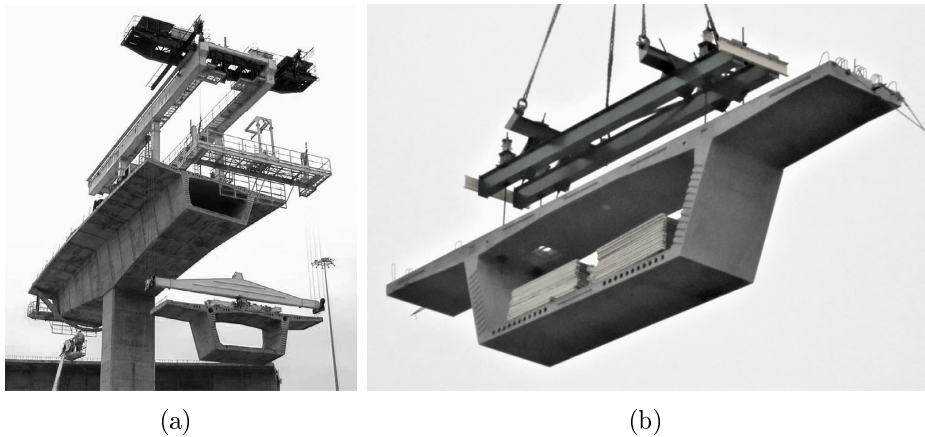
Segmental bridge made with post-tensioned prefabricated-concrete segments: (a) bridge under construction, photograph from [13]; (b) detail of one segment with evidence of the flat contact surface with shear keys, photograph from [14].
